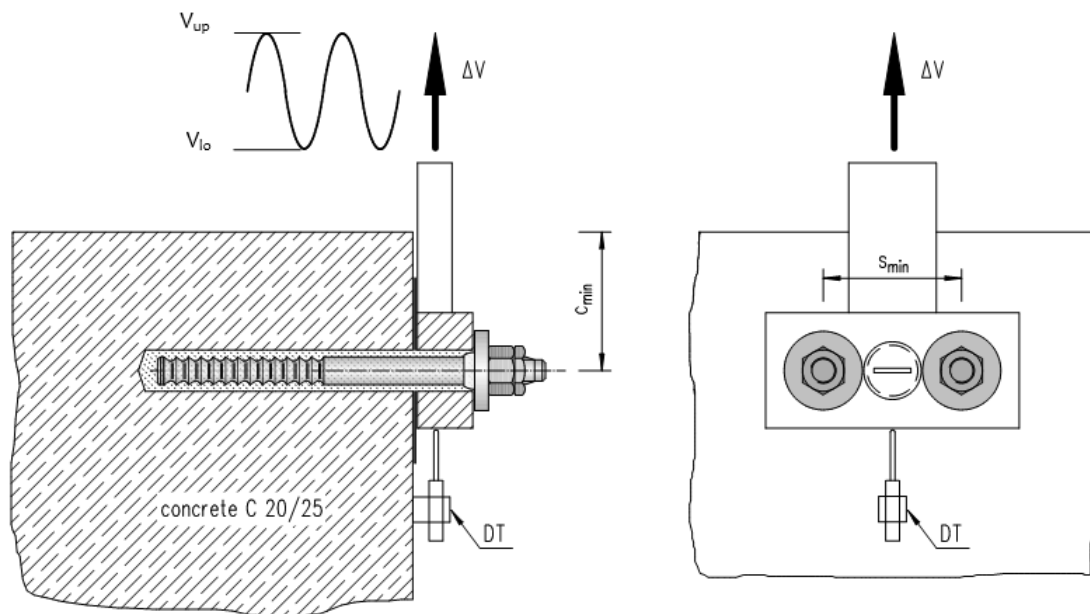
Example of test setup for concrete edge failure under shear in uncracked concrete
